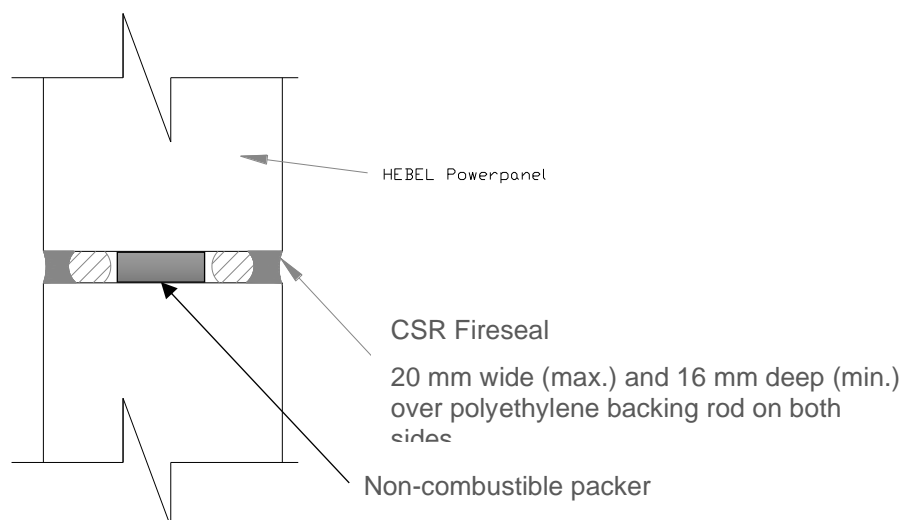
Horizontal joint Type 1a – 75 mm Hebel AAC panel (-/90/90 FRL)
